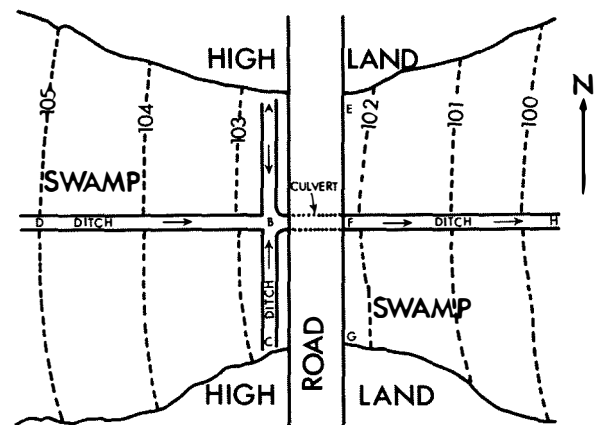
Planimetric view of well-drained swamp road crossing. European method of positioning collector and discharge ditches and culverts avoids backwater, flooding, and drowning of timber on upper side of road (left half of figure) (after Stoeckeler 1965).
